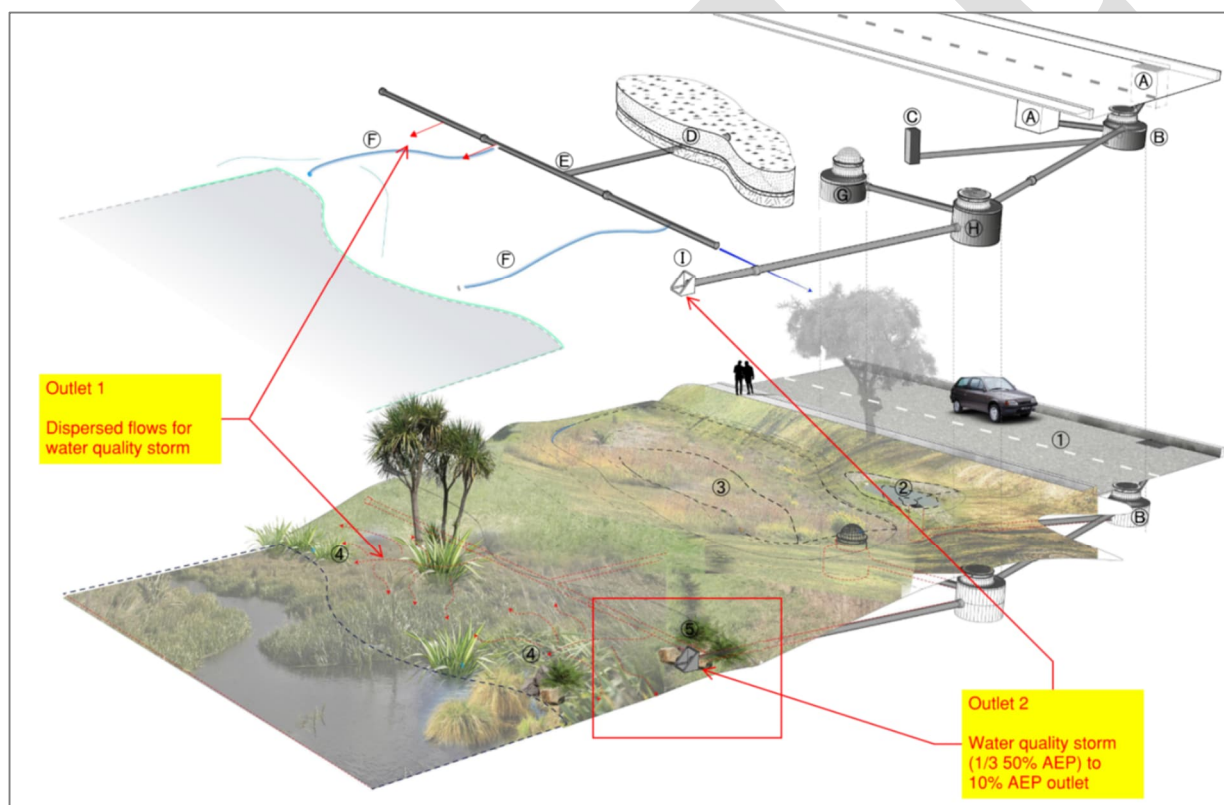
Graphic of stormwater treatment device installation and outflow, as well as a wetland swale (to left) constructed for water retention and habitat enhancement (Provided by Landlink).
